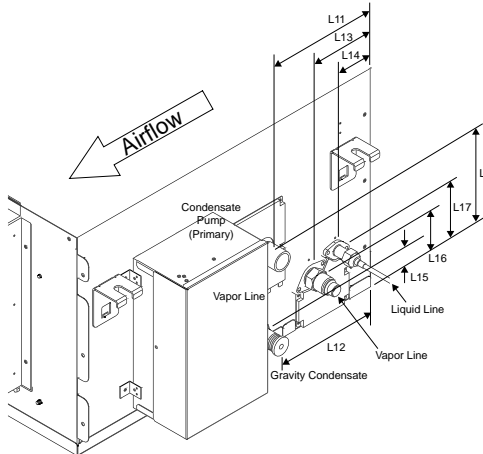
Low-Static Convertible Ducted (B1, B2) Indoor Unit Piping Connection Dimensions.
